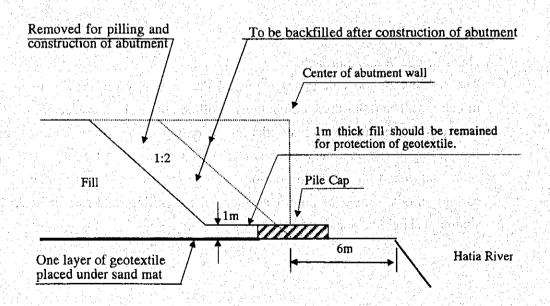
Longitudinal Section of Fill at Pilling and Abutment Construction for Hatia Bridge West Approach
